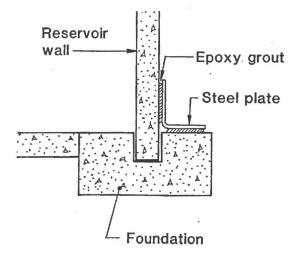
SECTION THROUGH WALL SHOWING STRENGTHENING PLATE
